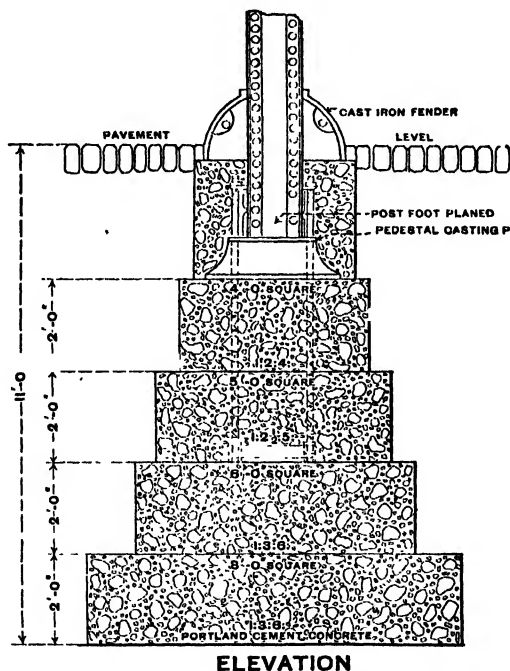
Typical Column Foundations of Boston Elevated Railway,
